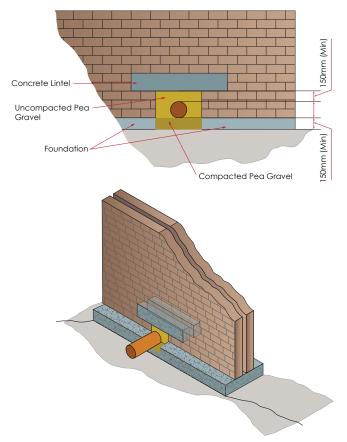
Detail (g) Protecting the pipe where walls/ foundation are built and cross
